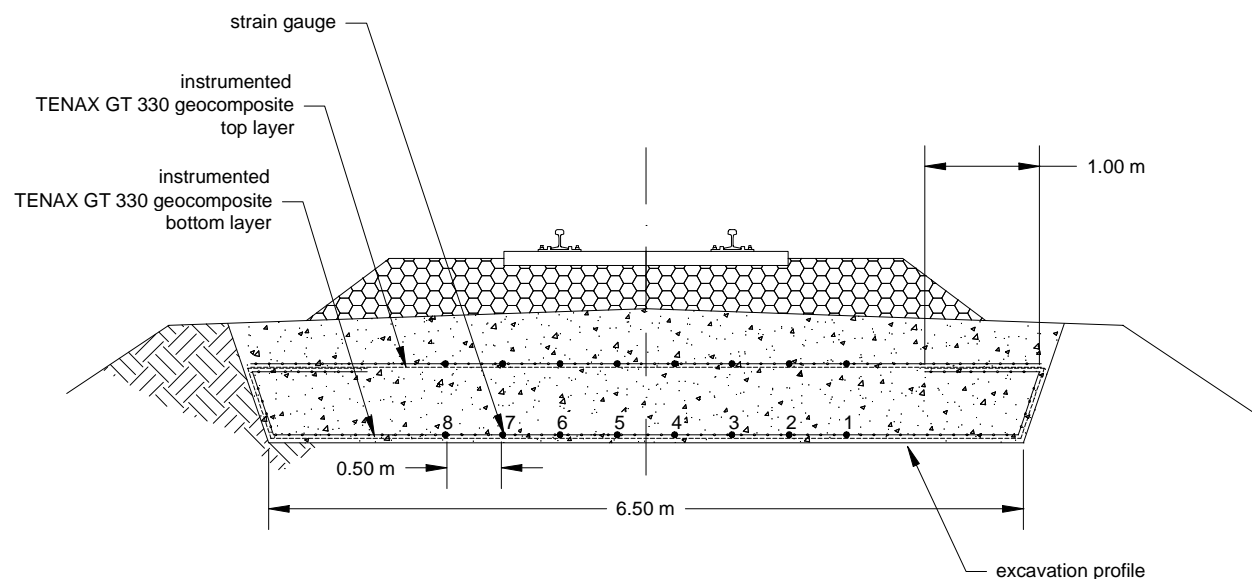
SP-2 cross-section showing within the railroad embankment: the wrapped around geocomposites layers, the strain gauge instrumentation layout, the ballast and sub-ballast structure.
